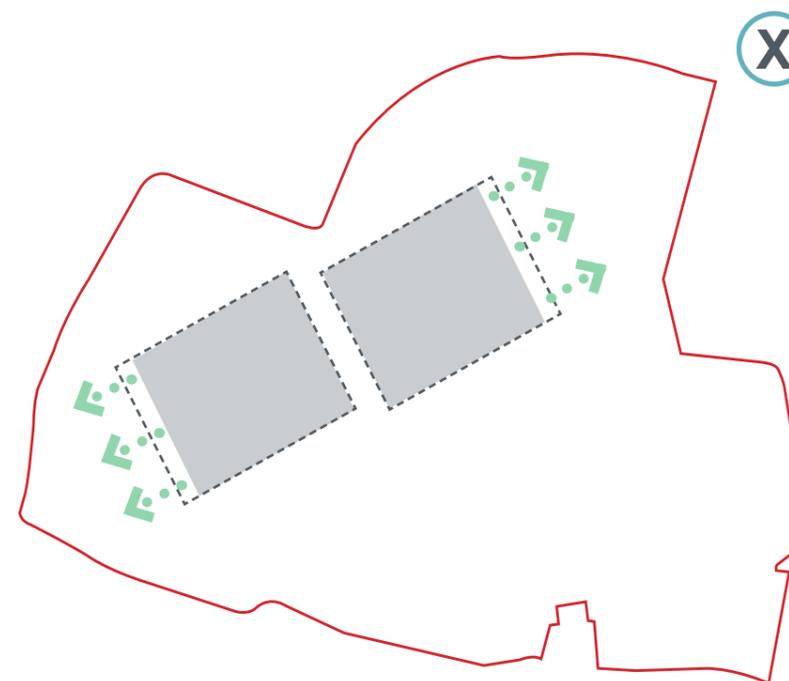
Shortened length, allowing widened edge planting to south west and north east
